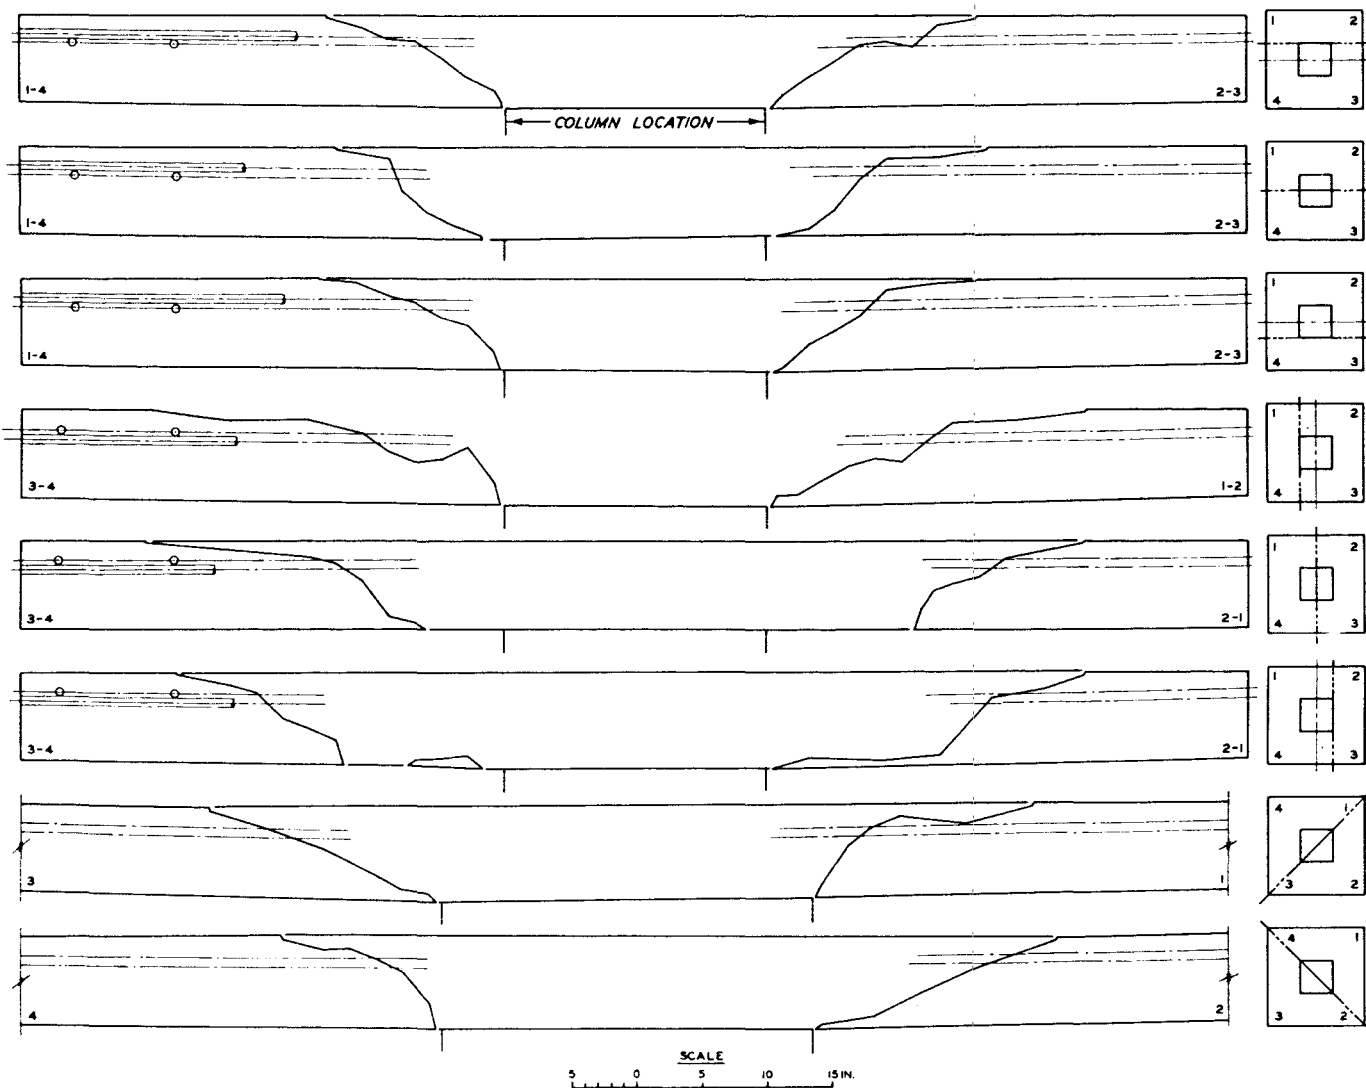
Profiles of slab failure surface, Specimen D4075-3.
